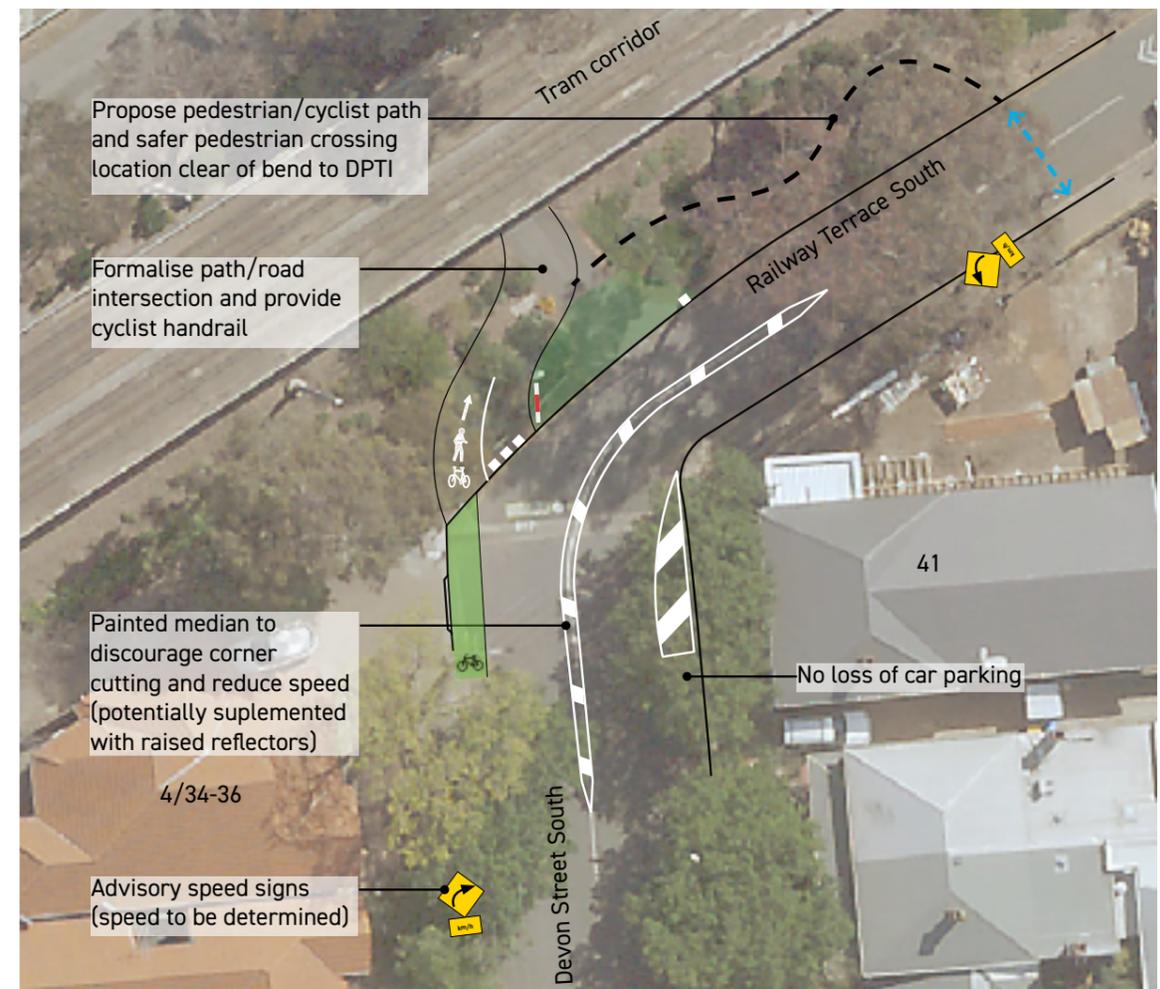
Railway Terrace South/Devon Street South proposed changes
